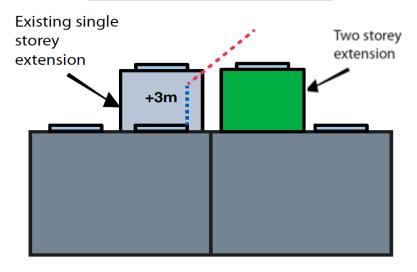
Proposed two storey extension where the neighbour has single storey extension.
